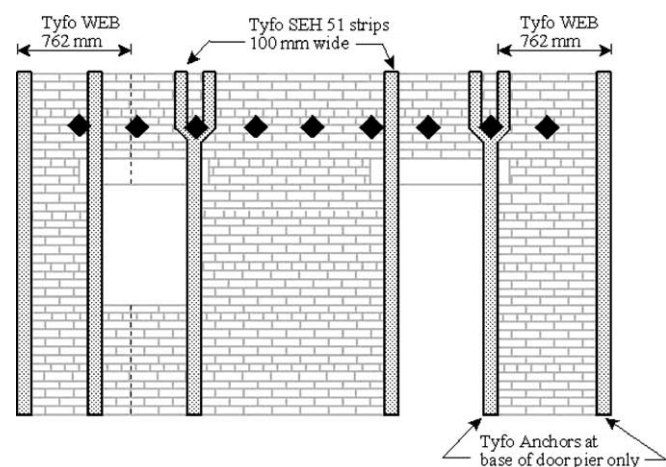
West wall elevation of URM specimen repaired with Tyfo strips and web (the east wall is simply a mirror image).
